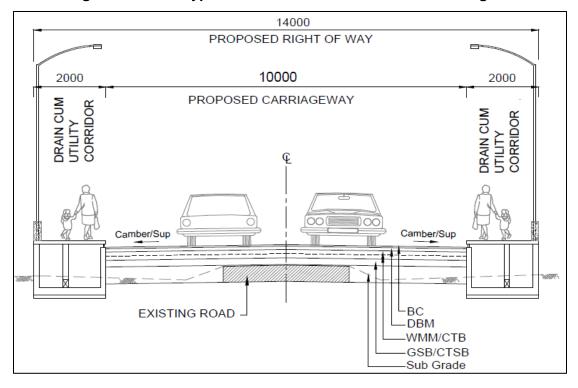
TCS-1: Typical Cross Section for 2 Lane in Existing Section
